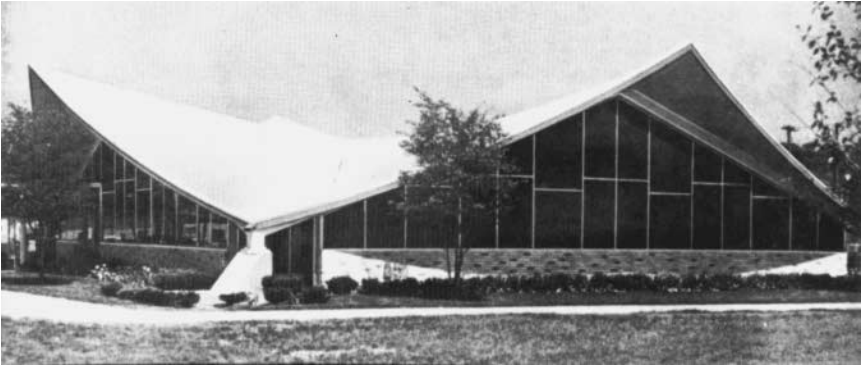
Hyperbolic paraboloid roof of welded laminated steel deck. (*Reprinted from Architectural Record, March 1962, copyrighted by McGraw-Hill Book Co., Inc.*)^{1.79}
